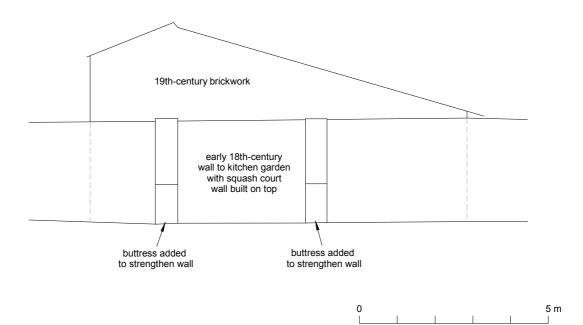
Structure 14, 1886-98 squash court north-west elevation.
